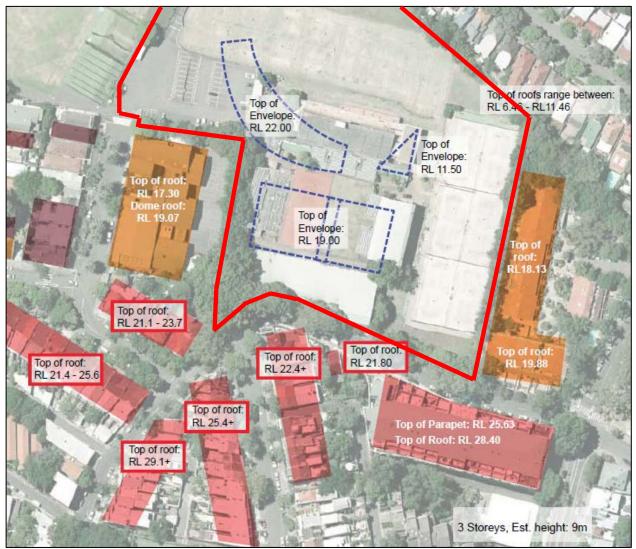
Proposed heights on the subject site in relation to adjacent development (provided by Applicant)
